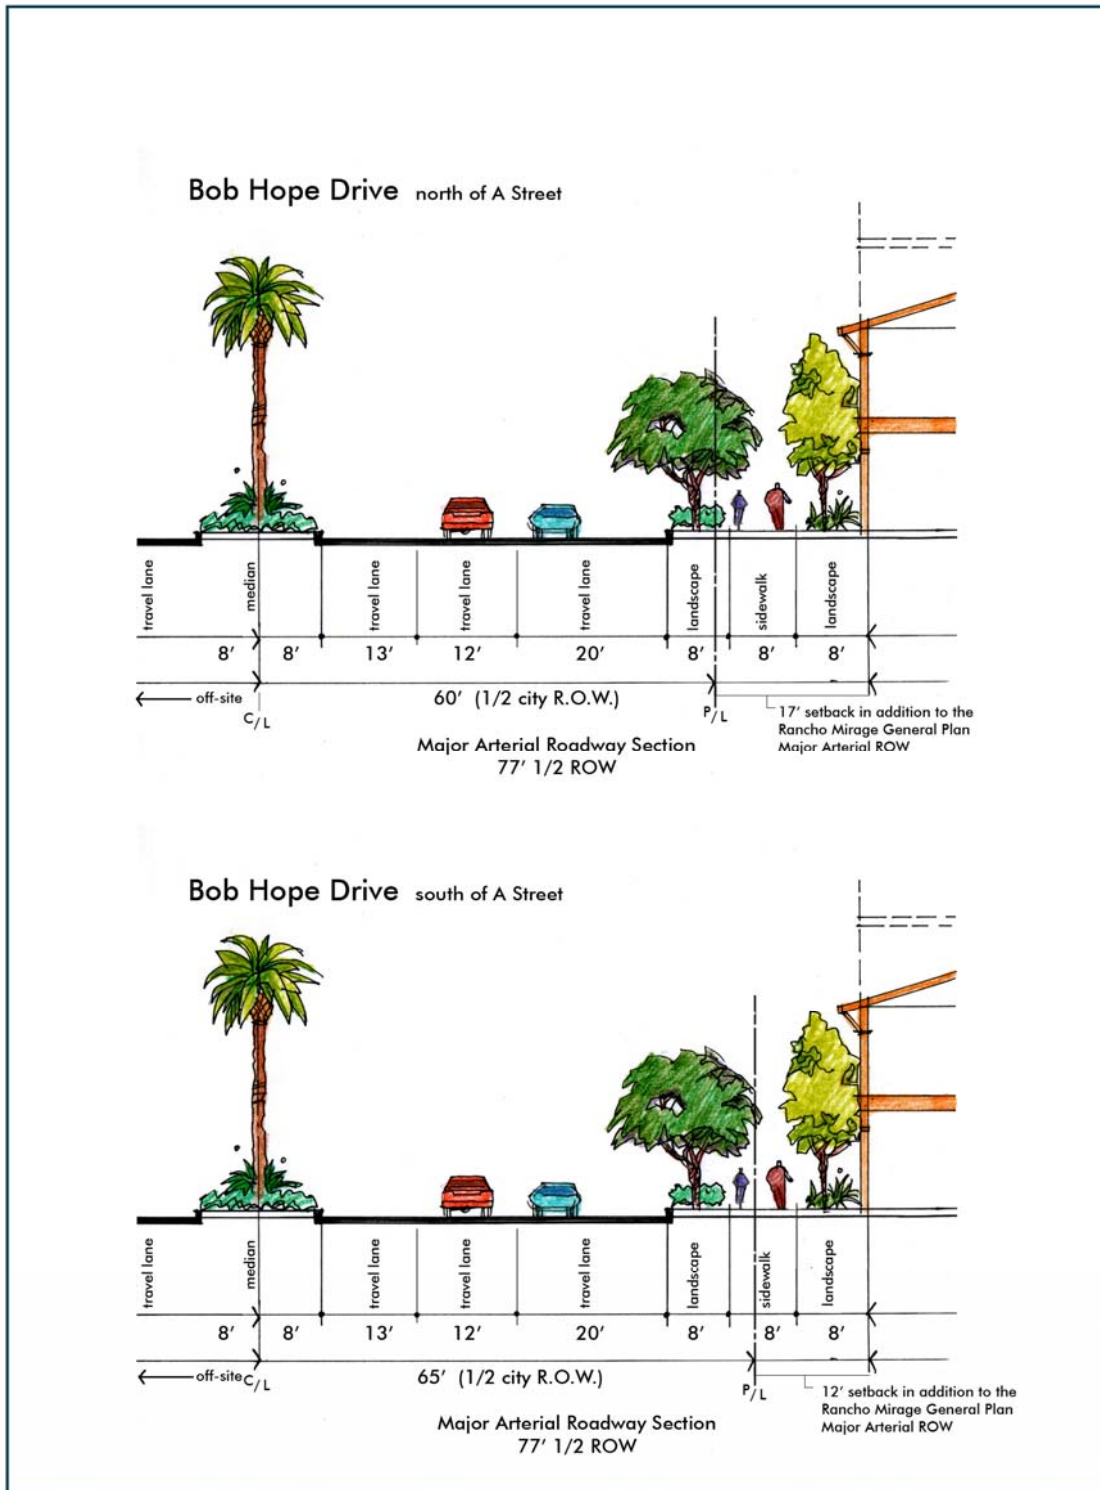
Major Arterial Roadway Sections: Bob Hope Drive
